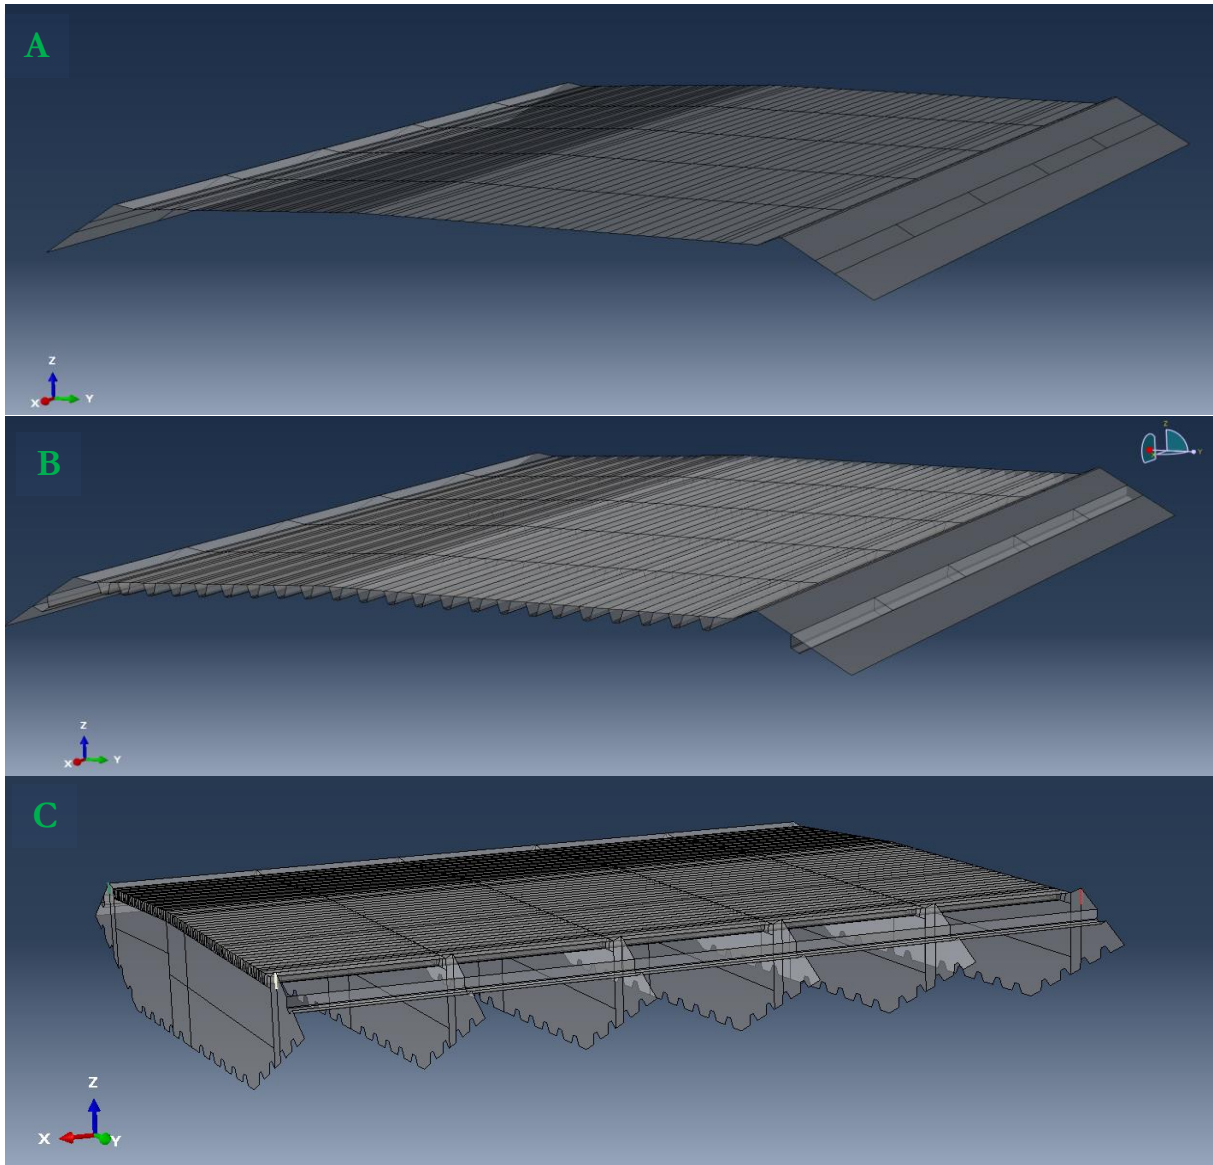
The FEM of the Orthotropic Steel Deck (OSD) of Hardanger bridge. (A) The upper steel deck of the road bridge, (B) The deck is supported by the longitudinal stiffeners (ribs), (C) which again is supported by the six transversal diaphragms.
